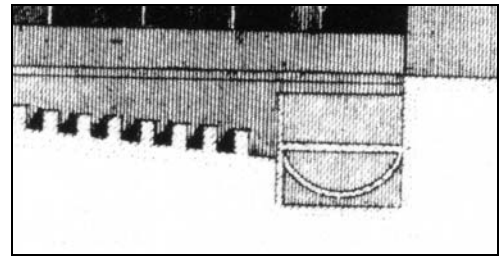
G. Saunders: ideal opera house; longitudinal section [1] : detail of the semicylindrical chamber under the orchestra pit floor
